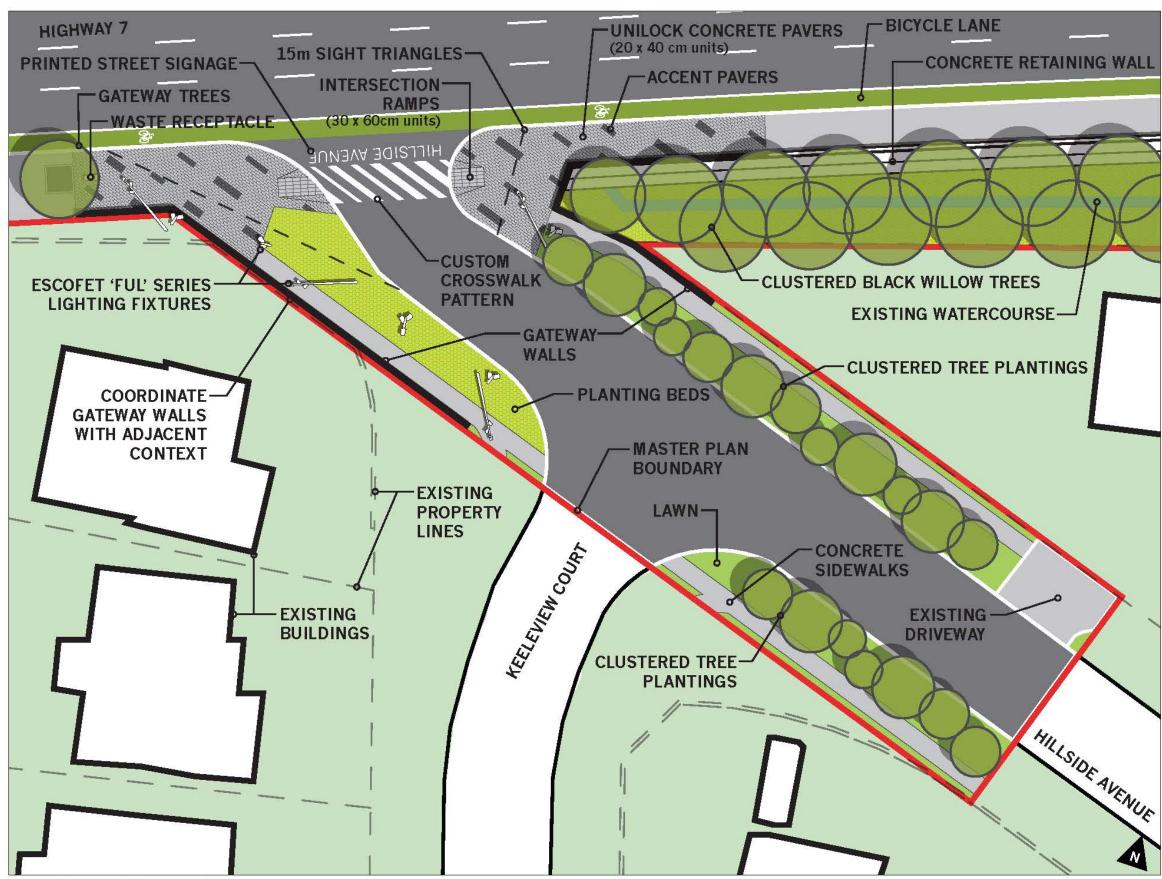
Hillside Avenue Gateway streetscape concept (secondary gateway).
